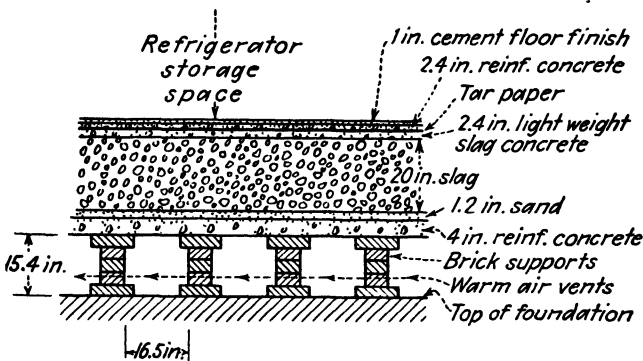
Warm-air vents installed under an insulated basement floor of a U.S.S.R. refrigerator warehouse prevented the freezing and heaving of the soil under the foundation. (After M. Steuerman, Ref. 326, 1936.)
